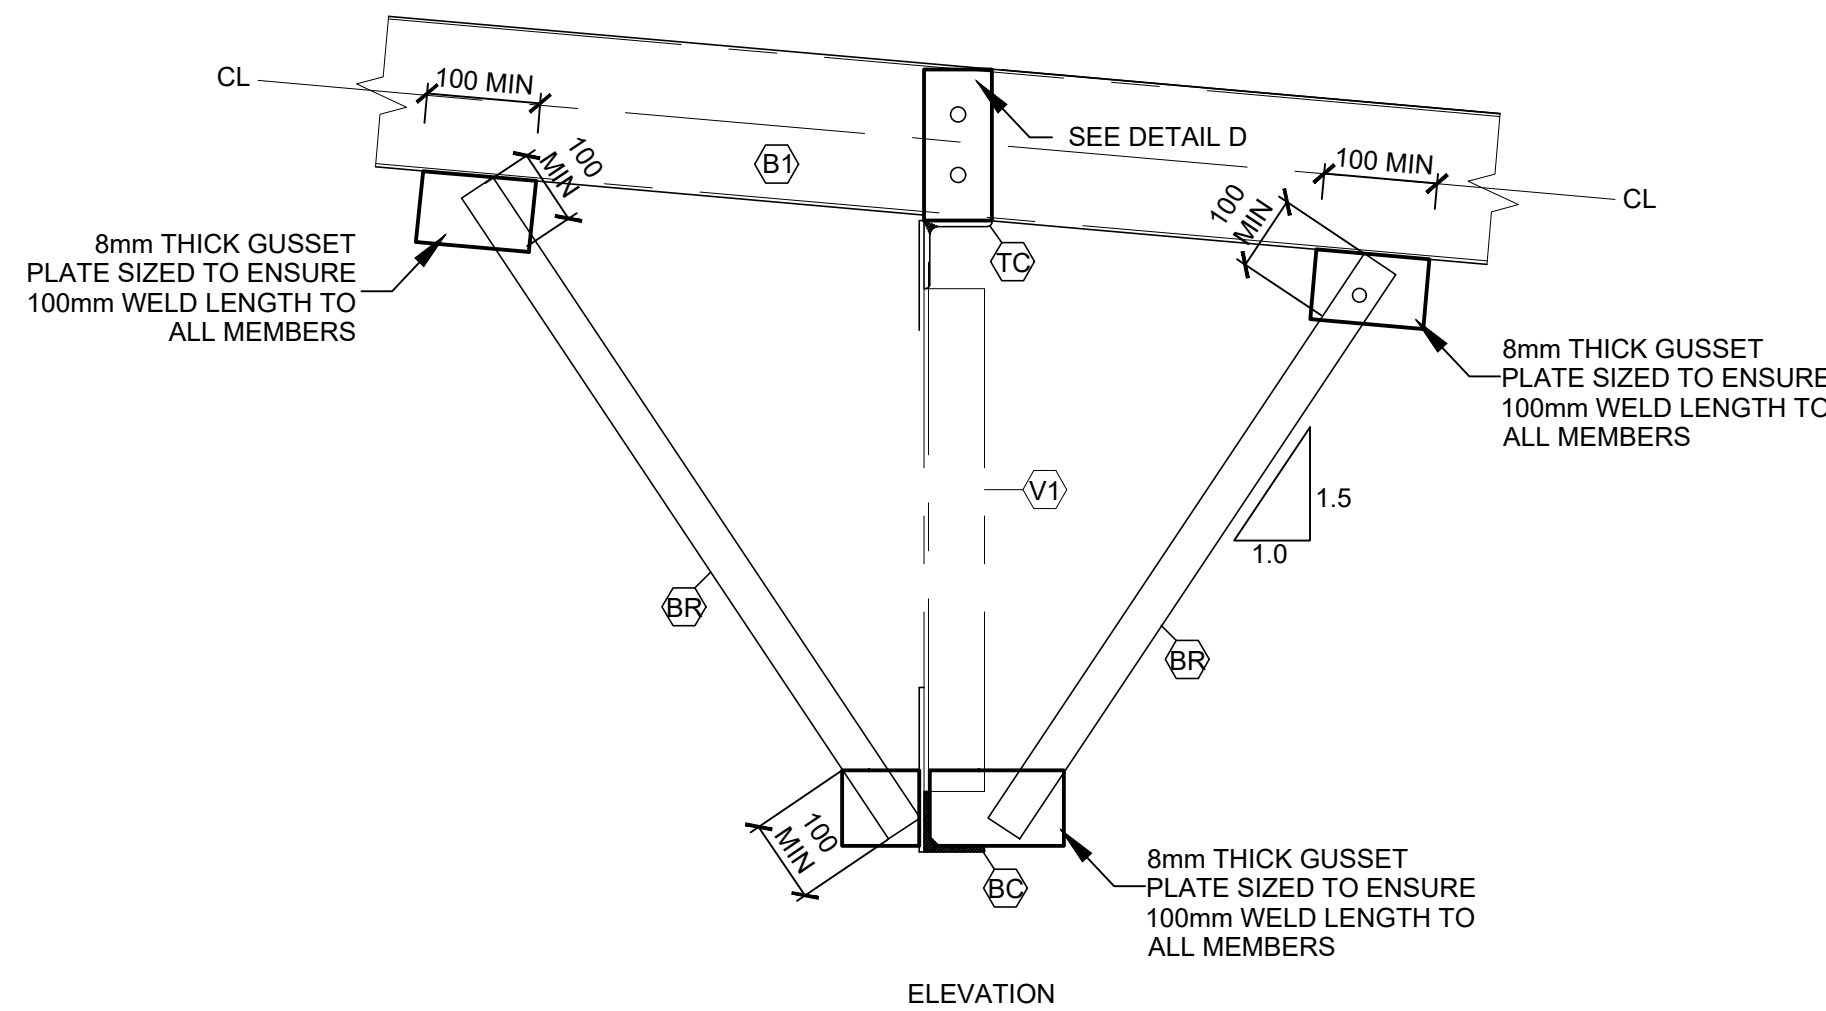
DETAIL F - TYPICAL GIRDER NODE CONNECTION DETAIL
